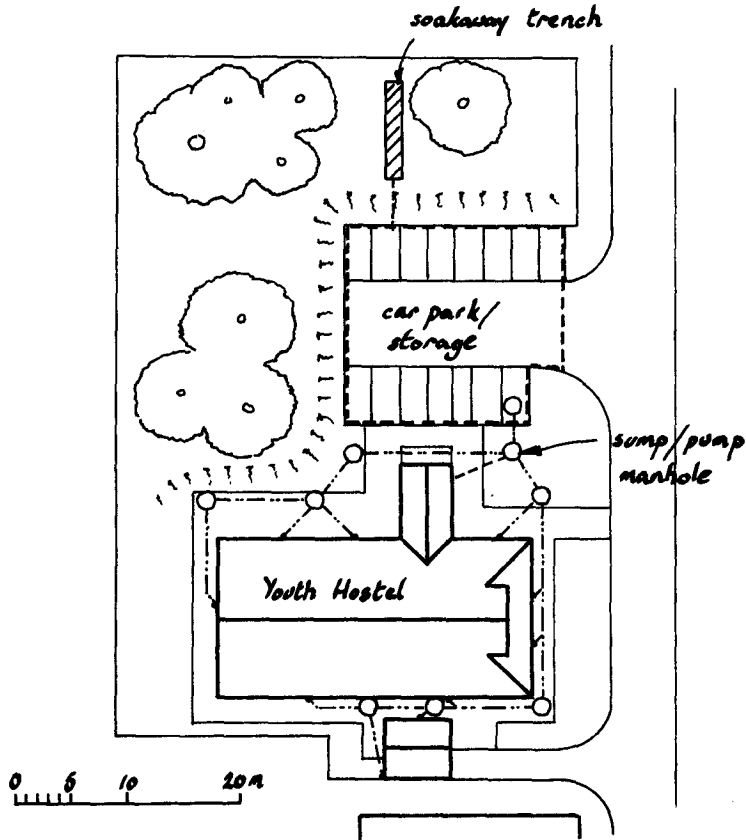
Details of the layout at the Edwinstowe Youth Hostel showing stormwater collection and storage system.
